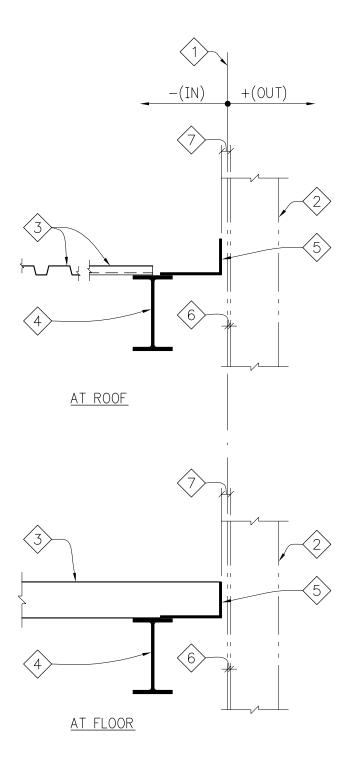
PRECAST CONCRETE ENGINEERING ISSUES - CASE C
